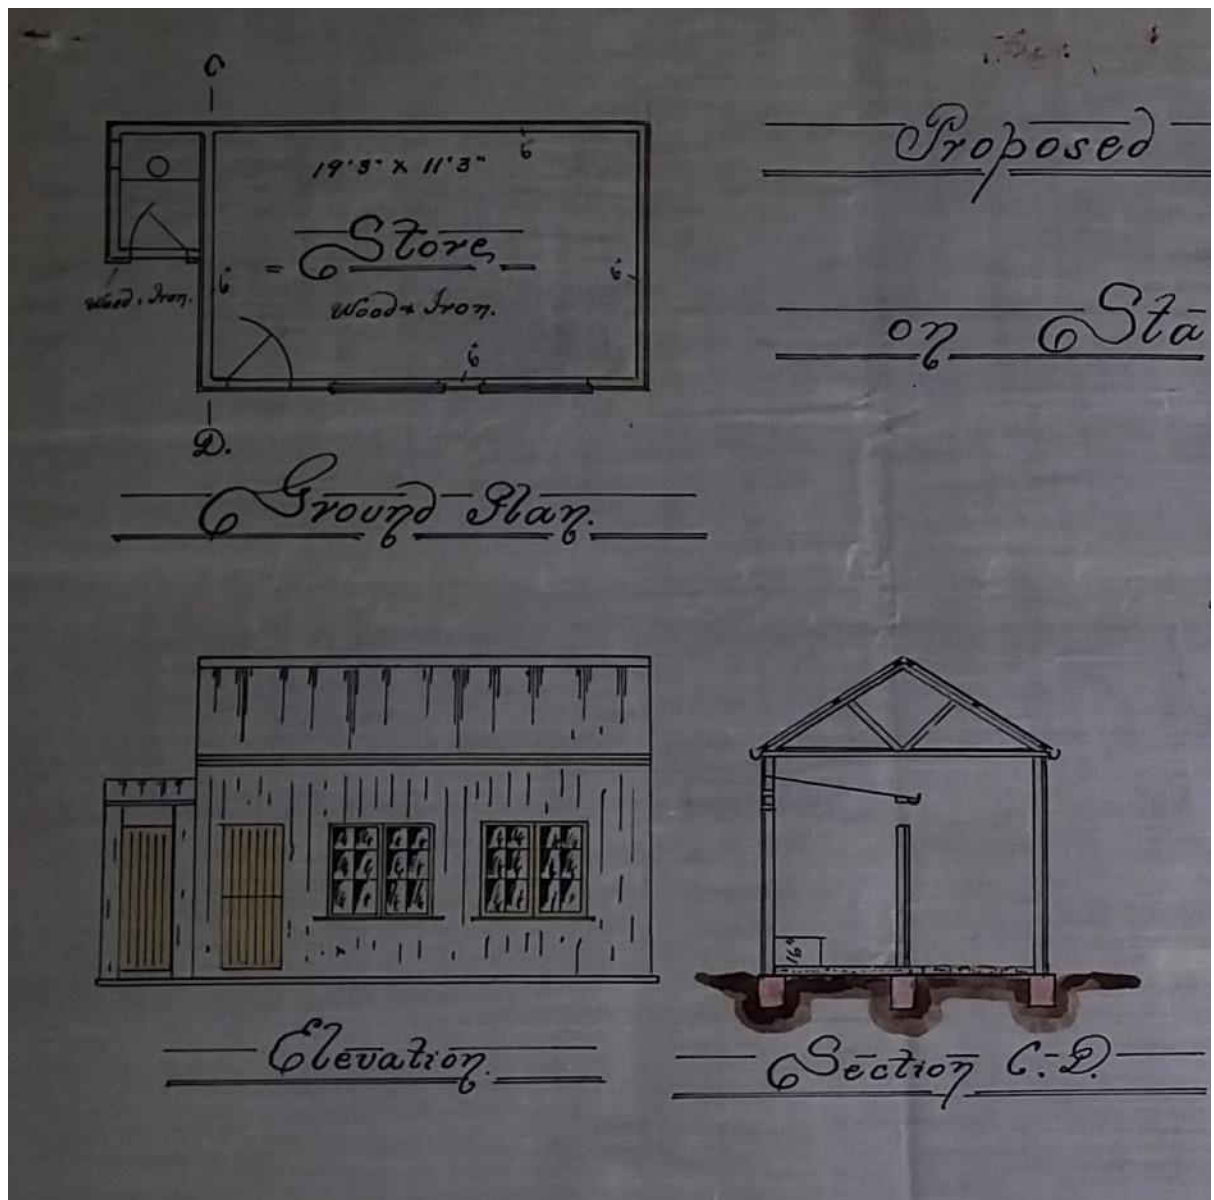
Detail of corrugated iron shed from original plan for Stand 274
